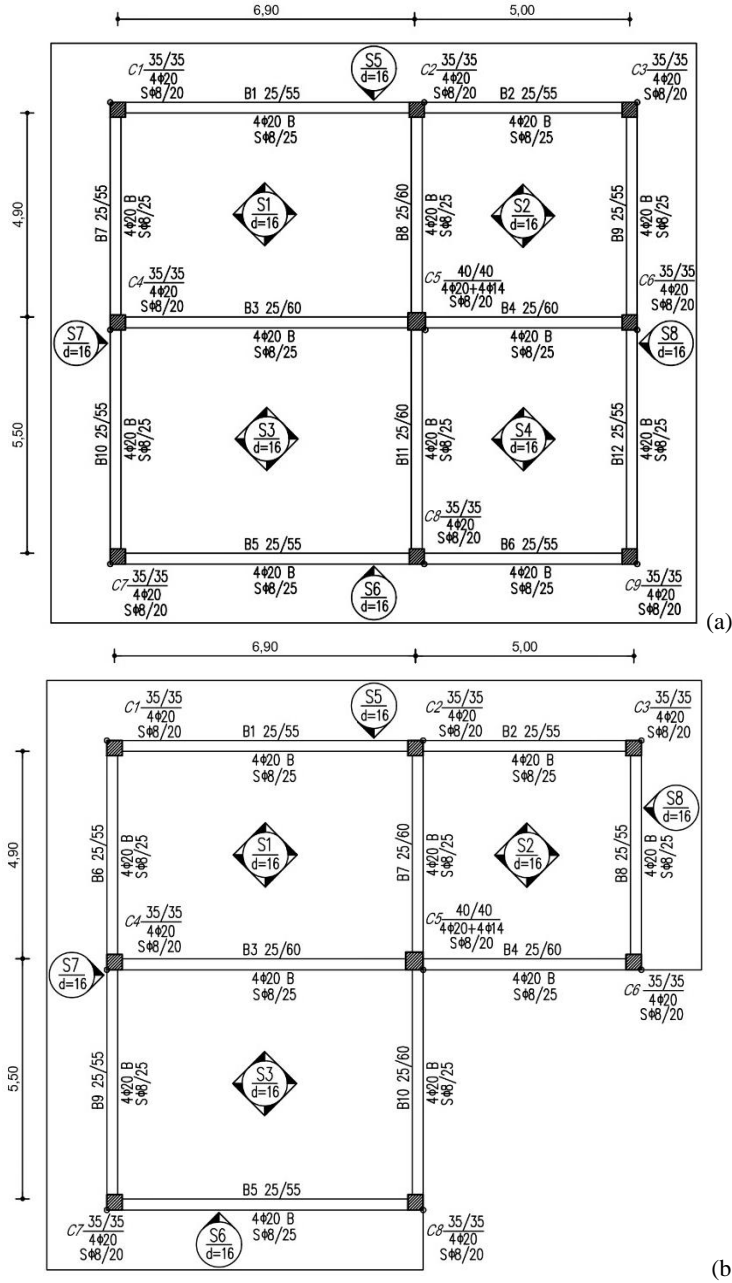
Structural floor-plans of the two buildings: (a) Building A and (b) Building B.
